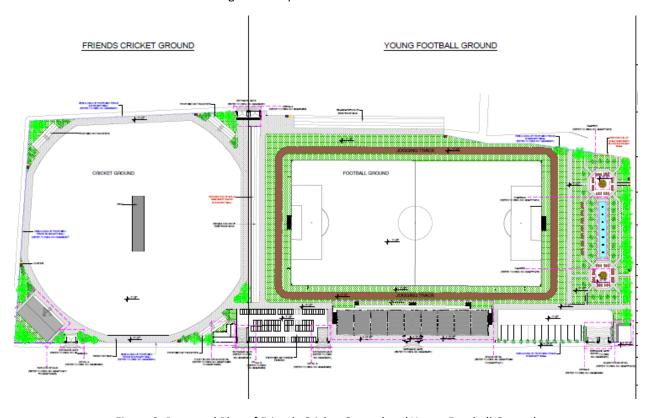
Proposed Plan of Friends Cricket Ground and Young Football Ground
